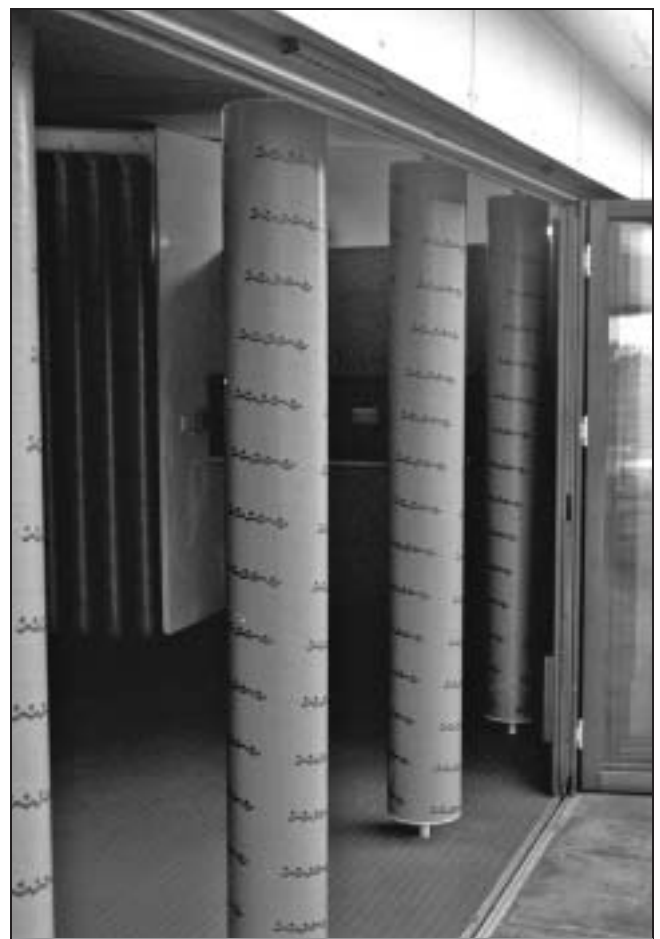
Made almost entirely of wood and cardboard, this school building (roof, walls, internal structure, air ducts) has been constructed to be fully recyclable at deconstruction
